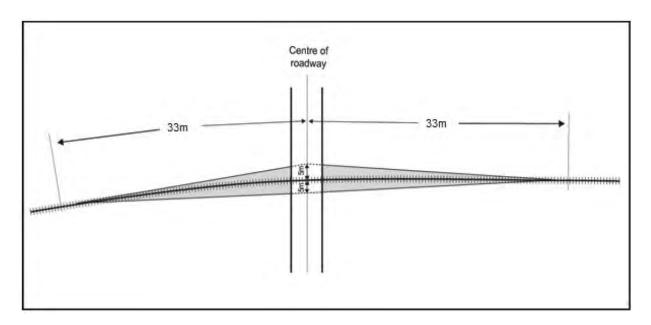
Restart sight triangles for public <u>road/rail siding level crossings</u>.
